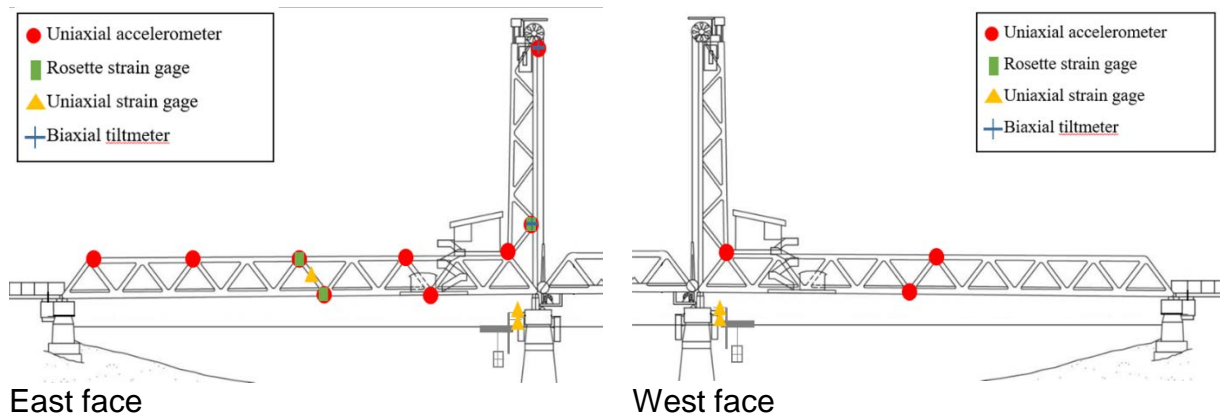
East and West face instrumentation plan for the Memorial Bridge, Portsmouth NH.
